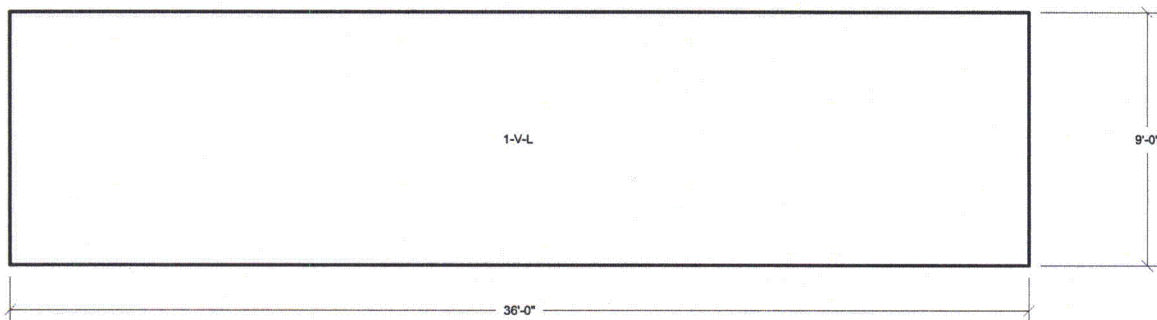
H.7-12: Tunnel Walls Looking From Outside
